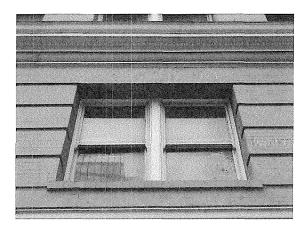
Photograph of typical punched window opening and painted brick cladding (photograph taken on 01/26/2018).
